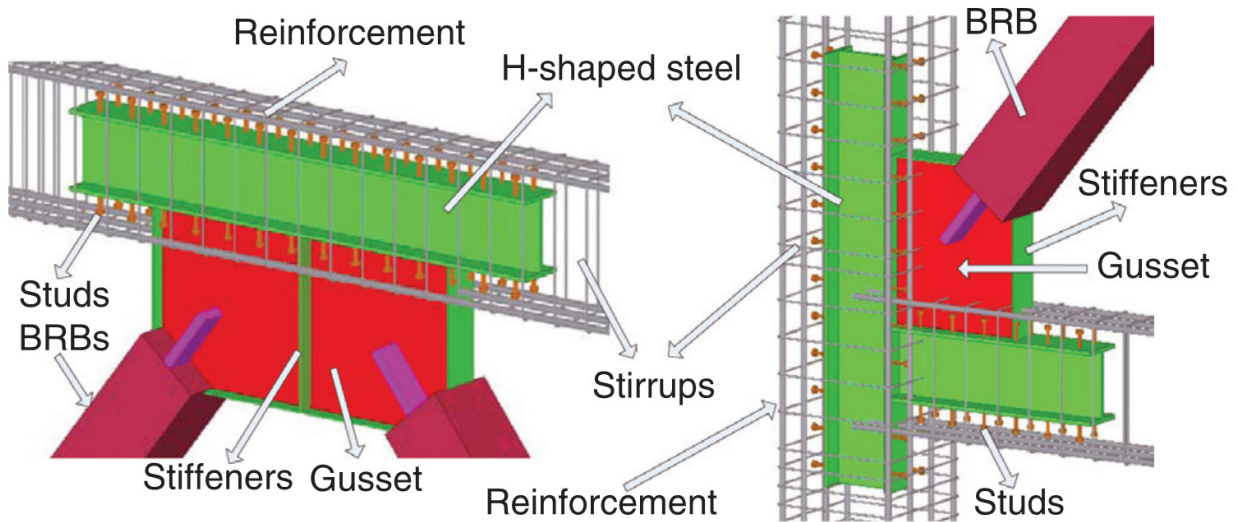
BRB Connection to Steel Reinforced Concrete, Li et al. (2013)
